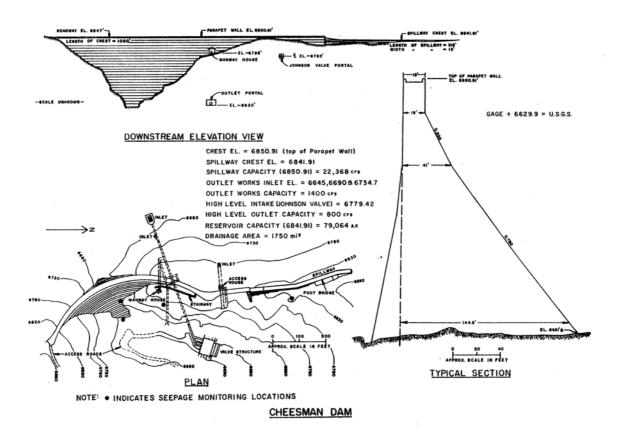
Plan, Profile, and Section of Cheesman Dam.
